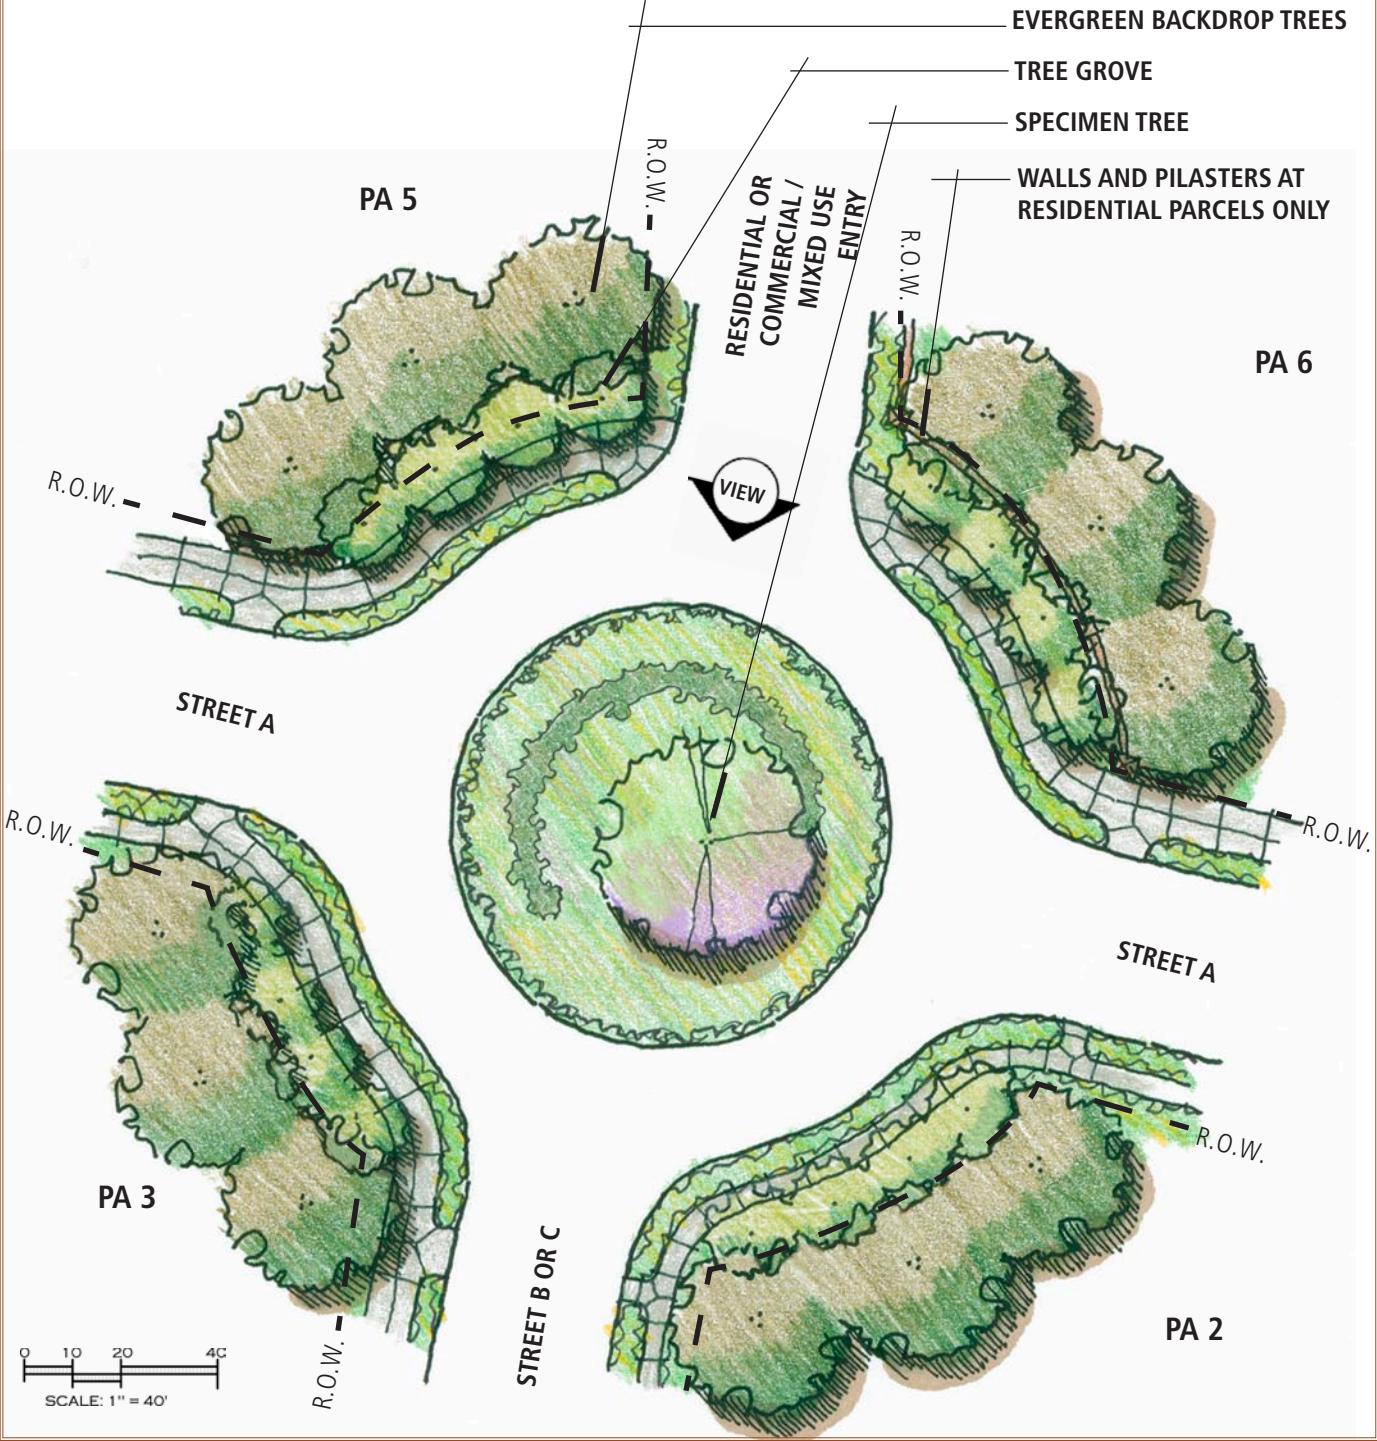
B: Secondary Intersection - Alternative 1 Plan View
